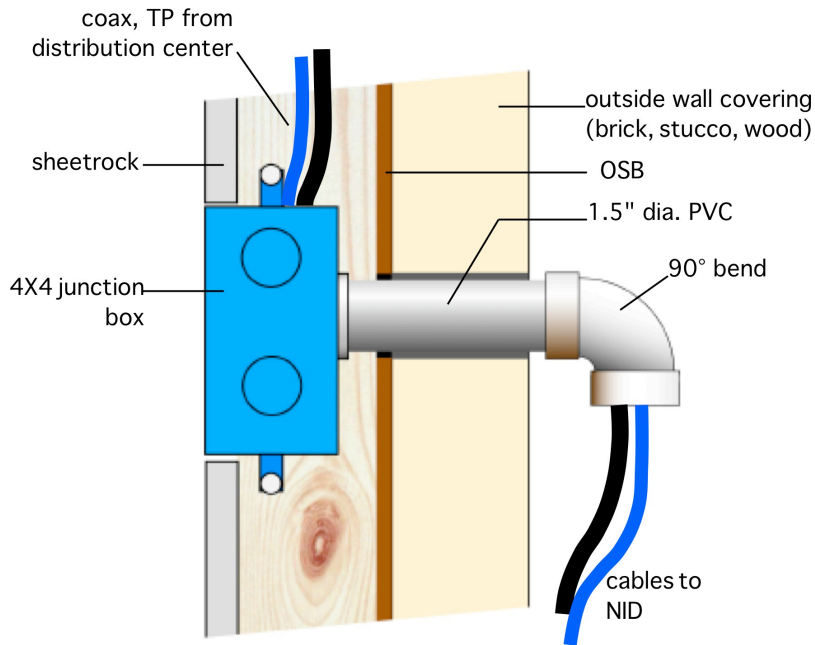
Section through outside wall showing PVC pipe mounted to wall stud. This allows cables to pass easily to the outside. This version uses a mud-ring on the inside for easy access
